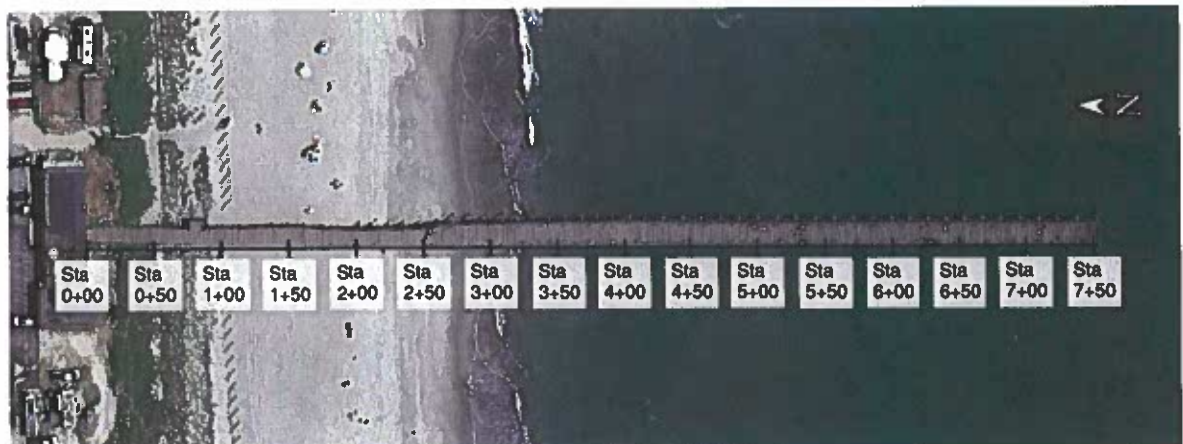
Holden Beach Fishing Pier Plan View and Project Stationing
